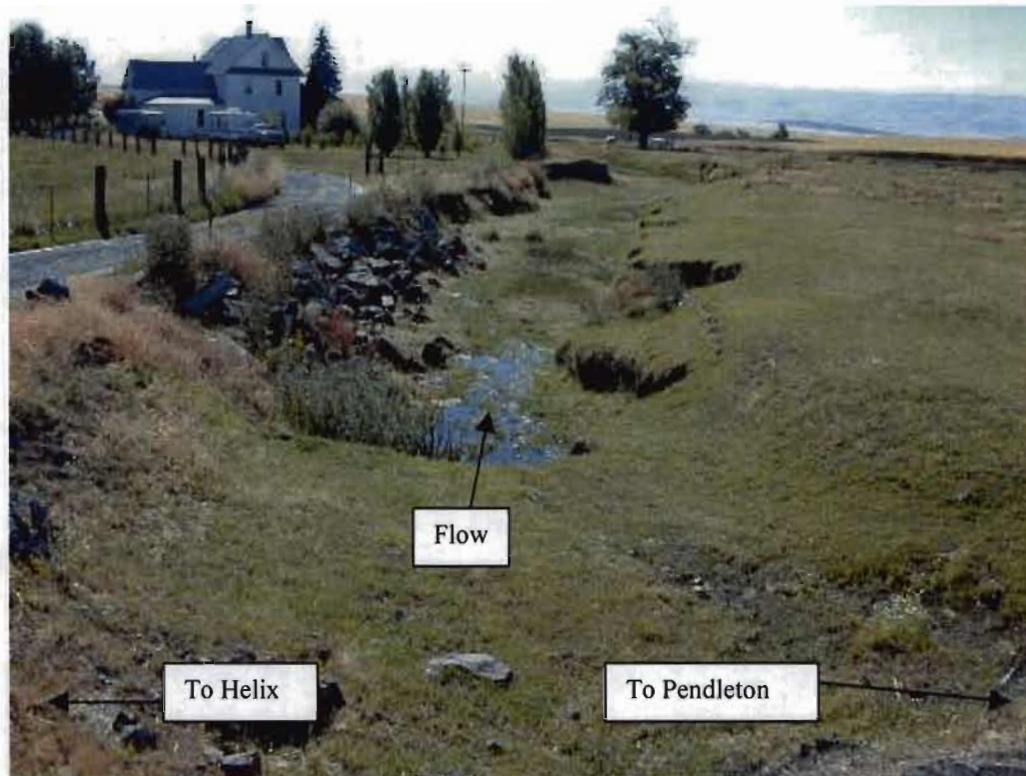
View of typical northeastern Umatilla County road crossing.
